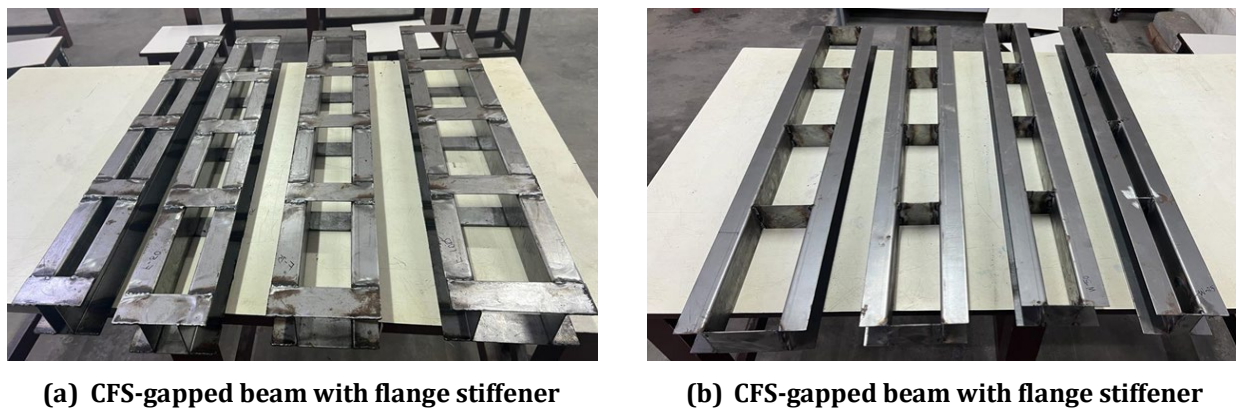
CFS gapped built-up beam specimens with stiffeners
